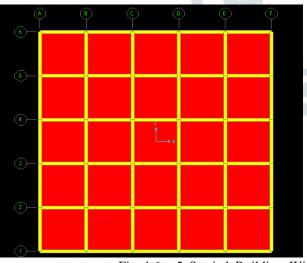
5 Storied Building With Water Tank – Plan View Modeling of 10 Storied building in SAP is done as
